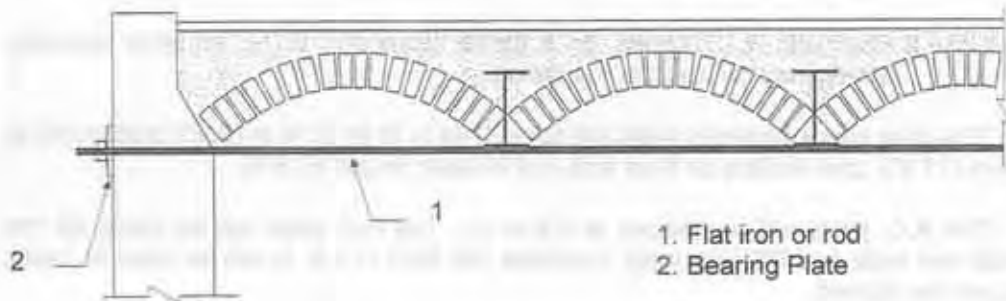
B Seismic Strengthening of Jack arch floor/roof
